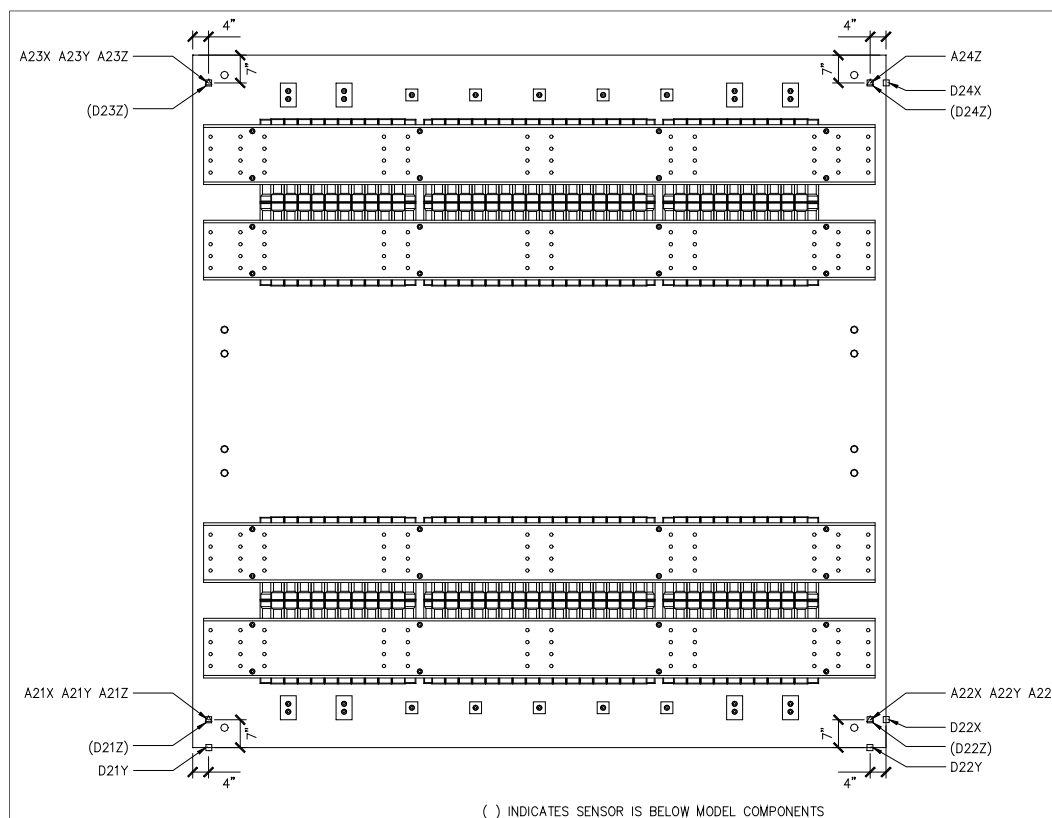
Plan view of the second-story slab showing instrumentation.
